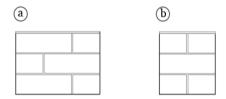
Masonry sections: a- wall 38 cm; b - wall 25 cm
